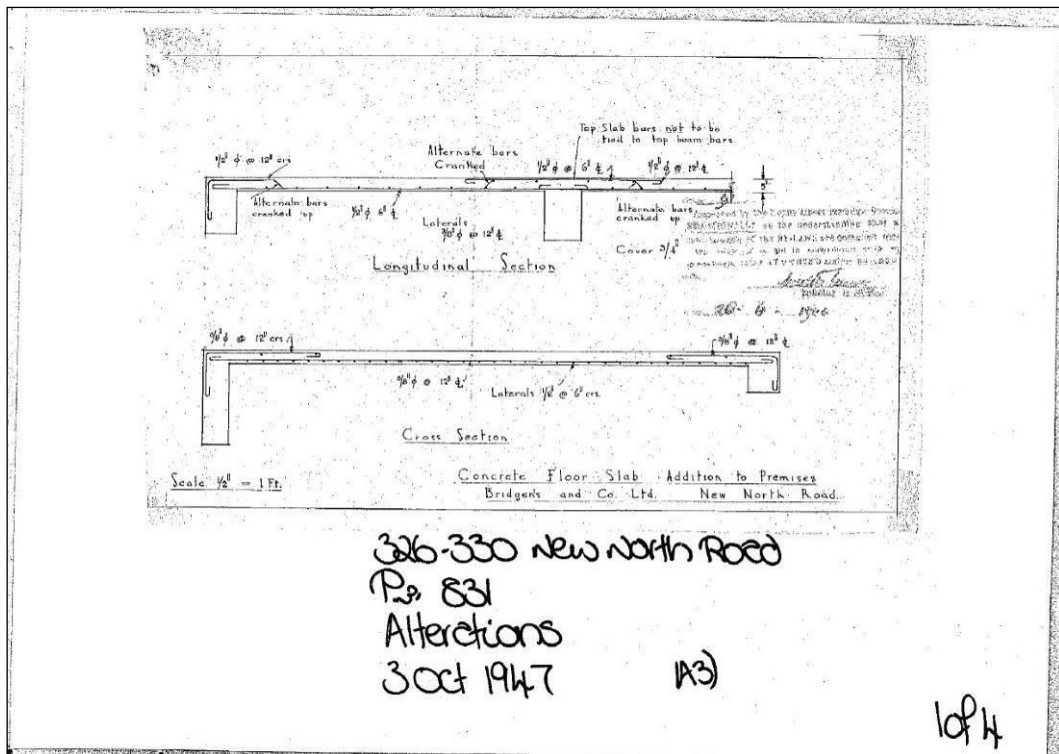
1947 Drawings for 'Extensions to Factory New North Road for Messrs Bridgens and Coy Ltd' - by Norman Wade, Architect: Structural Slab Sections. Auckland Council Filenet. Accessed October 2016.
